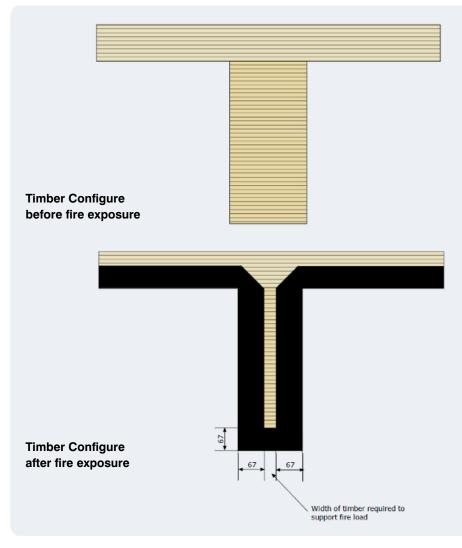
Comparison of Timber Cassette floor joists and Residual Section after 90 minutes of fire exposure.
